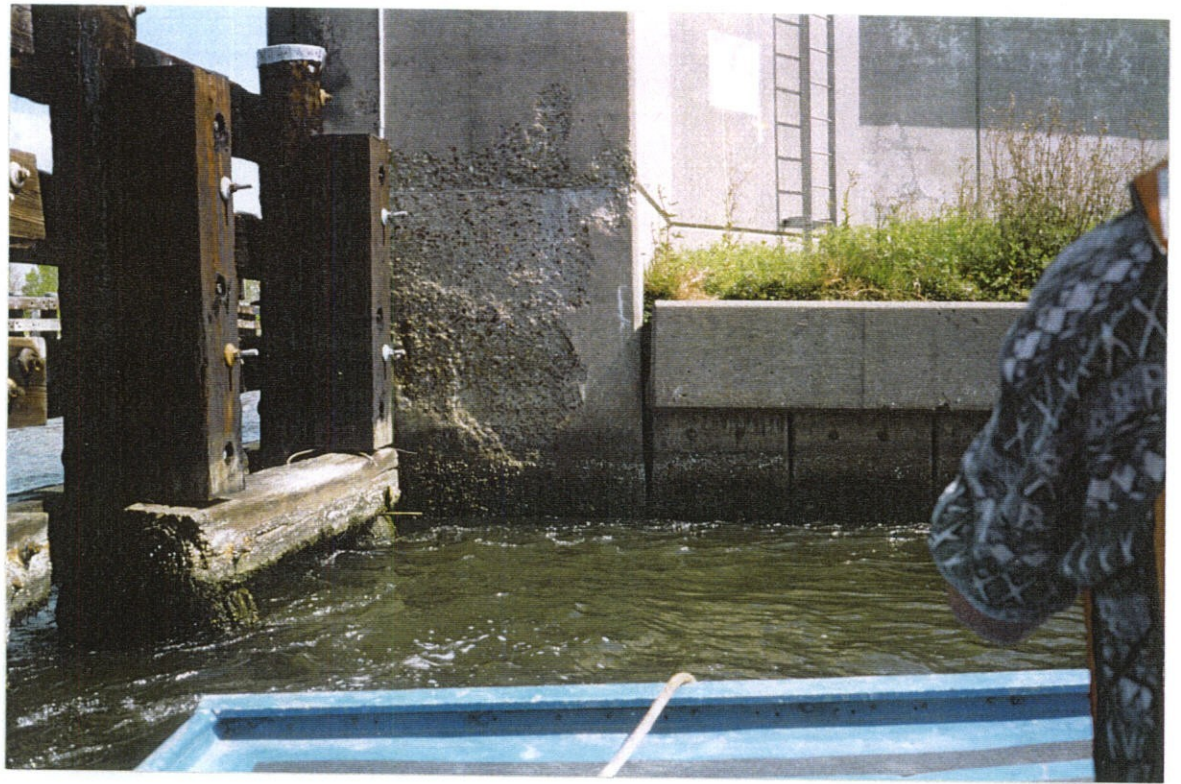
SPALL ON SOUTHSIDE PROTECTED SIDE FACE OF GATE BAY WALL.
